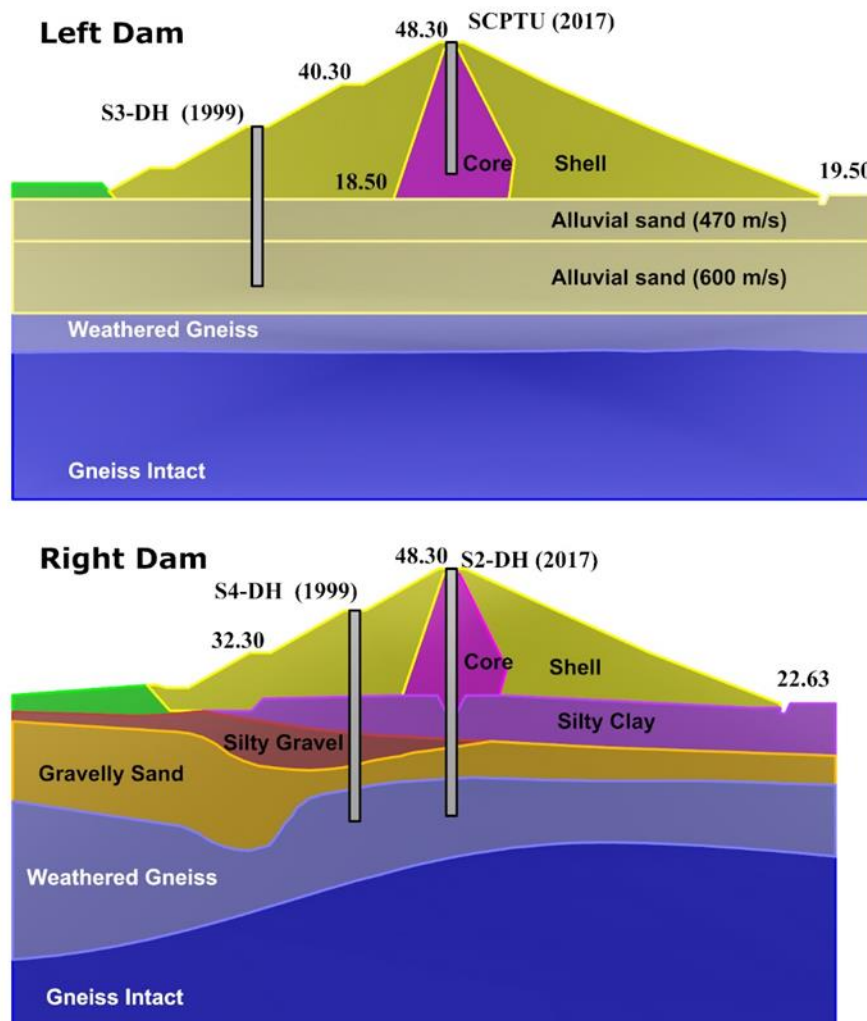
Central cross-section of left dam (above) and right one (below).
